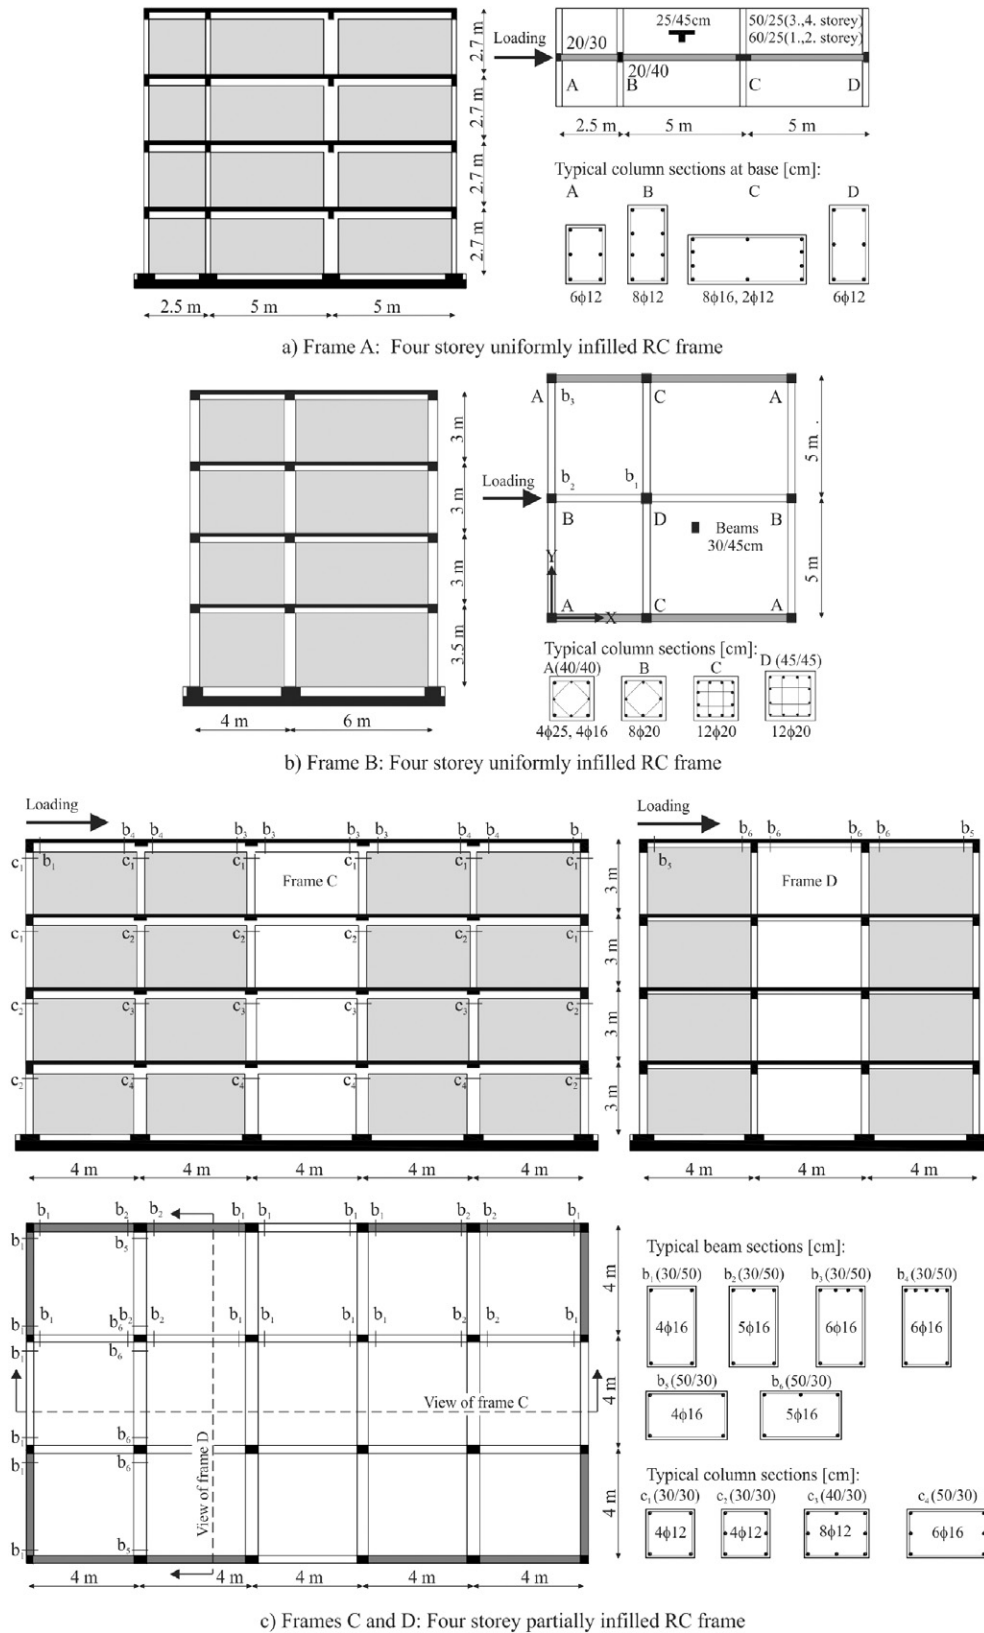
The global geometry and typical reinforcement of the columns and beams of the example structures.
